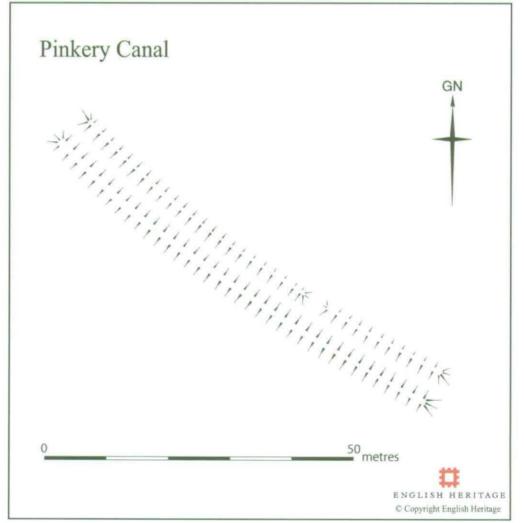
Earthwork plan of a truncated section of the Canal, 1:500
